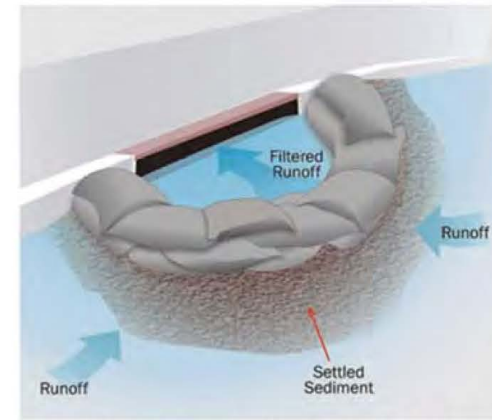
Illustration of a storm drain inlet with rock-filled bags filtering stormwater.
